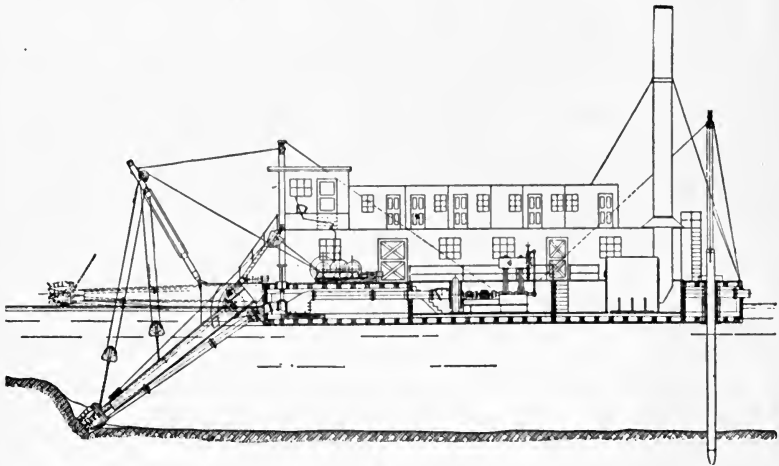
Side view of hydraulic dredge. (Courtesy of Norbom Engineering Co.)
